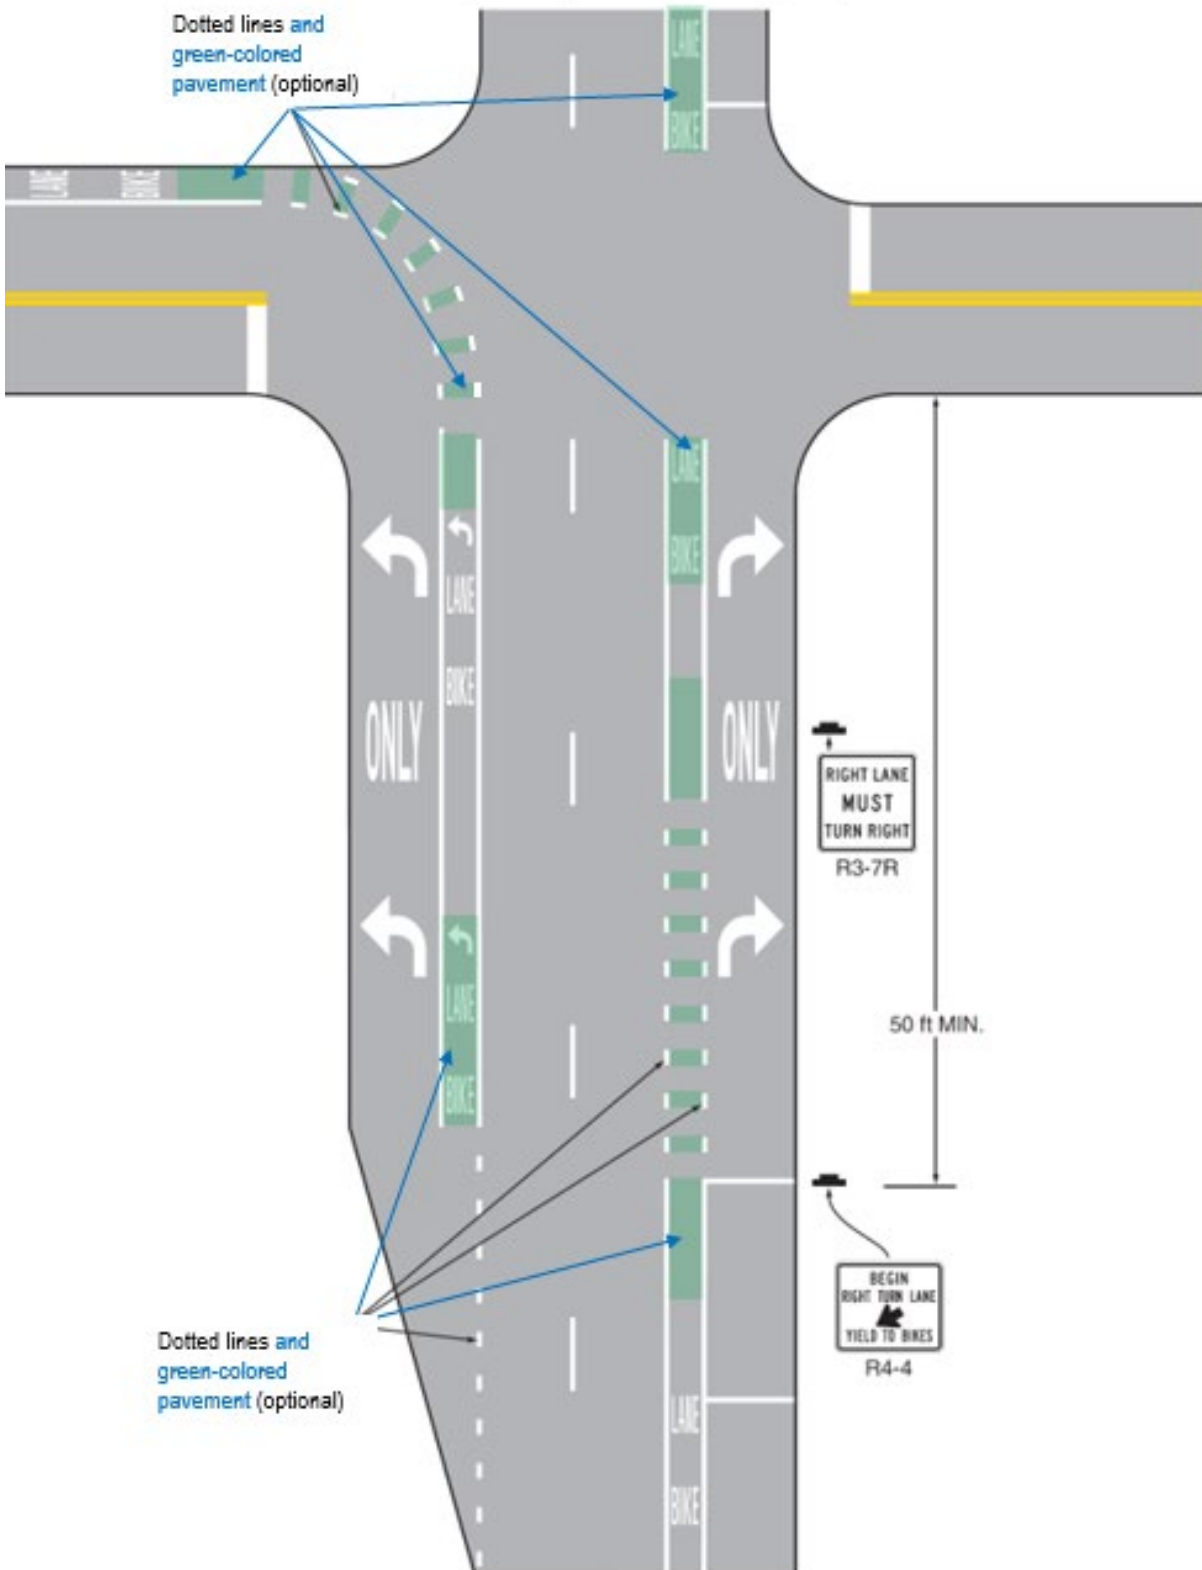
C-1a(CA) - Alternative Examples of Intersection Pavement Markings
